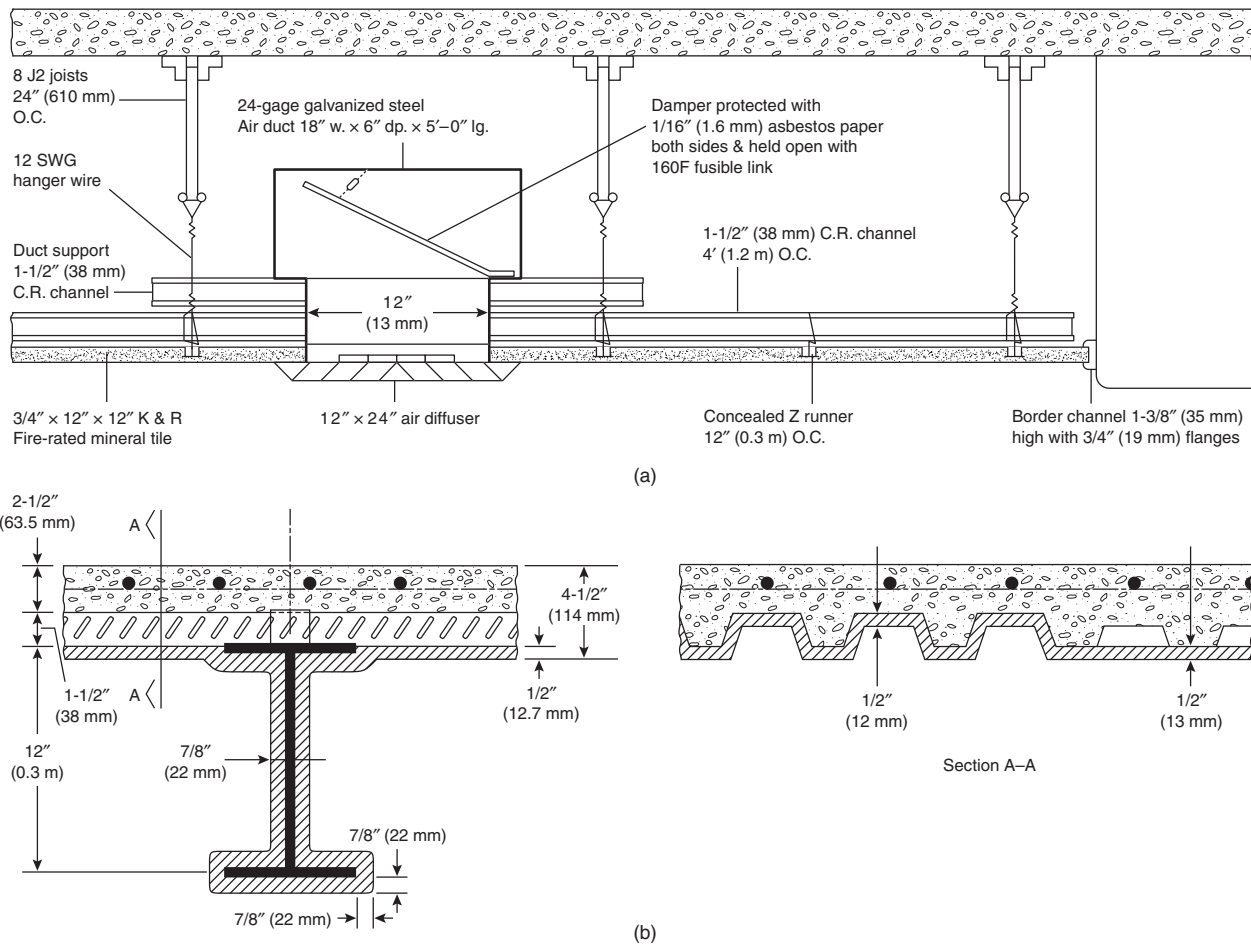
Membrane method of protection,²⁴ (a) Cross-section of a floor-ceiling system with conventional sheet steel fusible-link damper for protecting typical ceiling outlets in galvanized sheet ducts; (b) Sprayed contact fireproofing applied directly to the underside of formed-steel decking and to a supporting steel beam.
